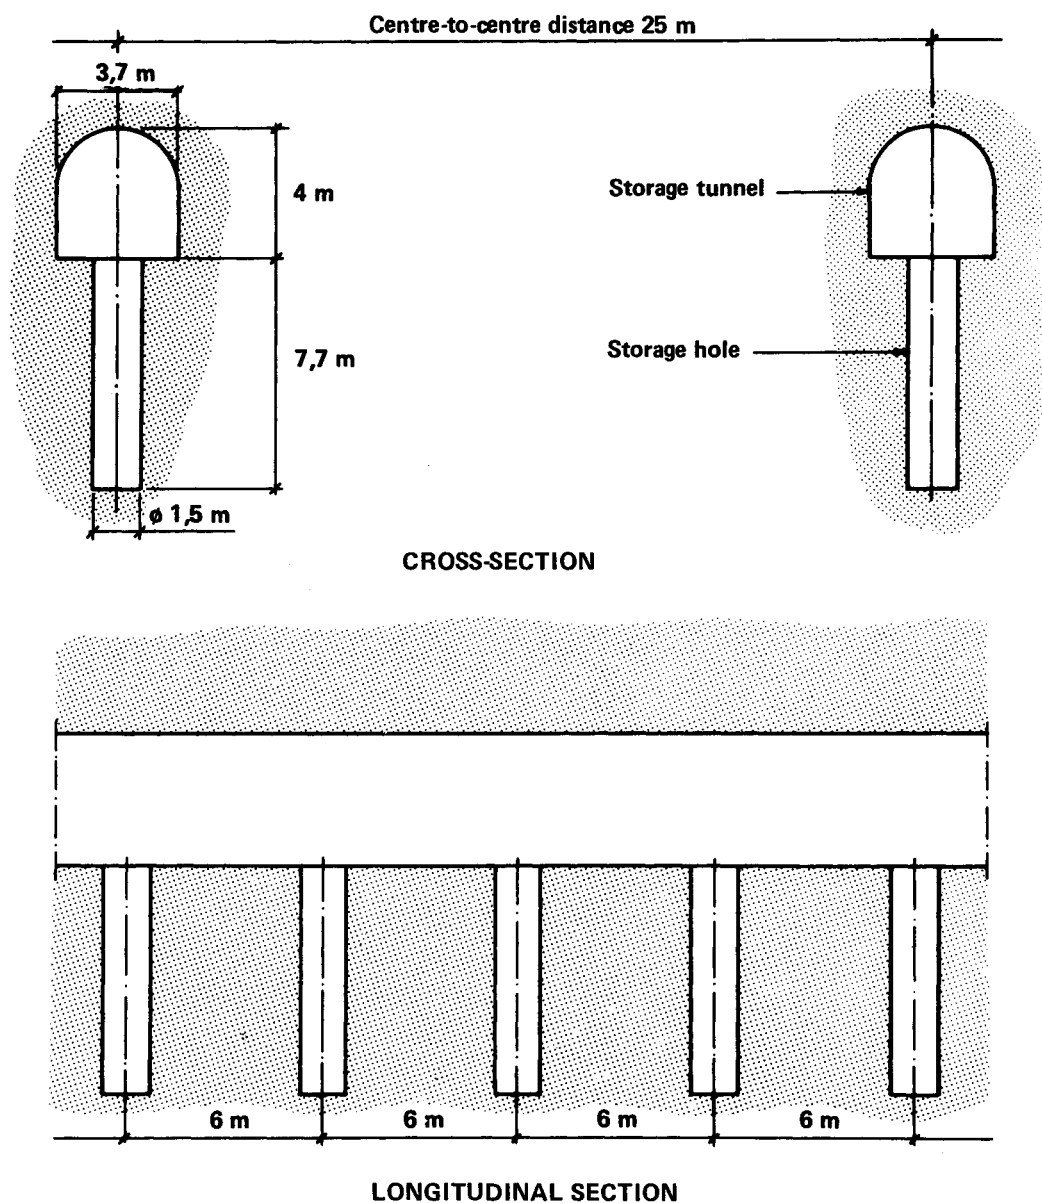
Cross-section and longitudinal section of storage tunnels in the final repository. Each storage hole is designed for one canister.
